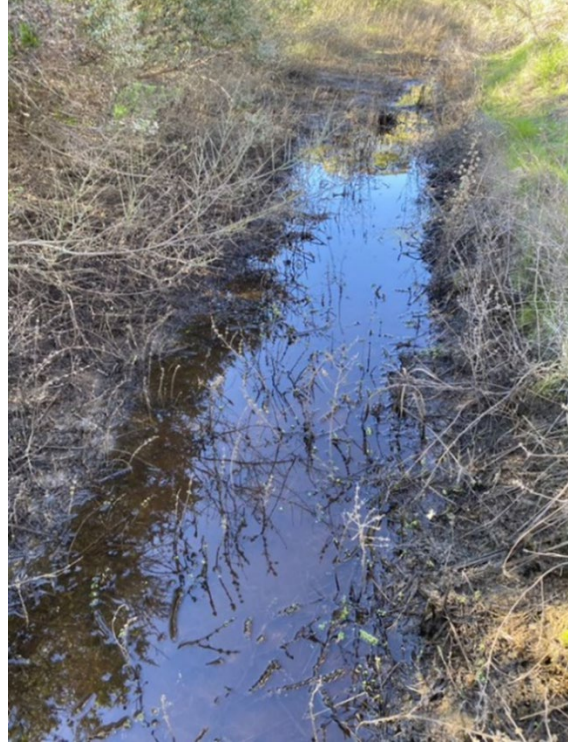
Constructed diversion ditch (drainage segment 1-4) along access road (left side of photograph). Photo facing southwest.
